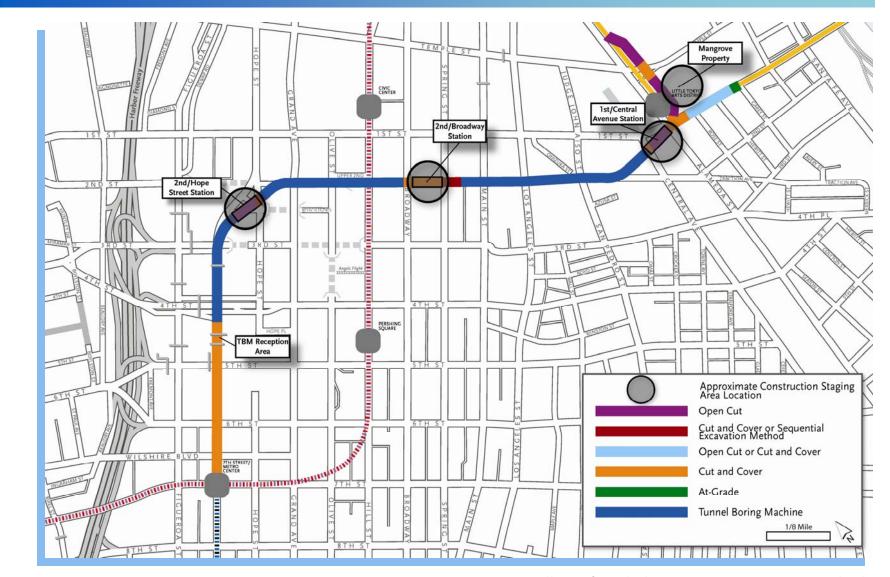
Locally Preferred Alternative Construction Methods
